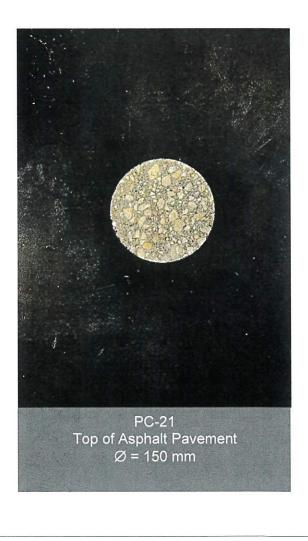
Specimen from Sargent Avenue, Westbound Curb Lane
